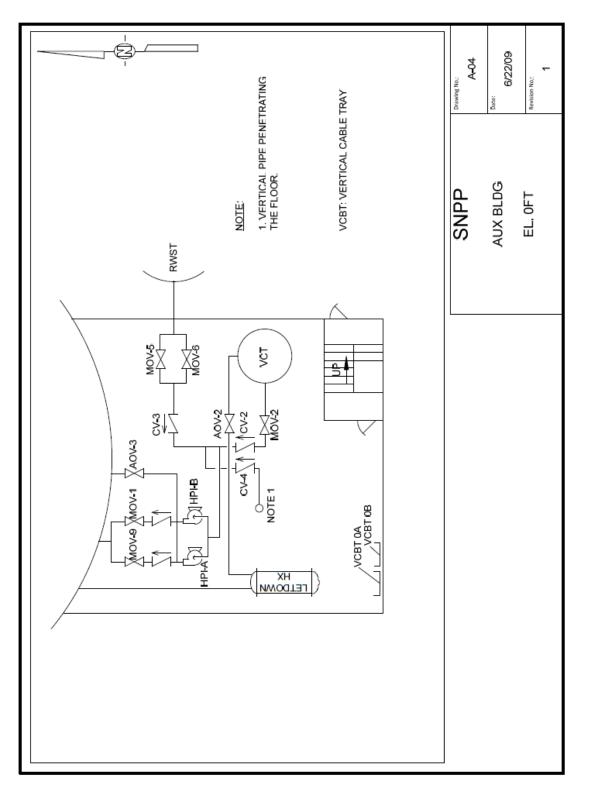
Auxiliary Building – Elevation 0 Ft
